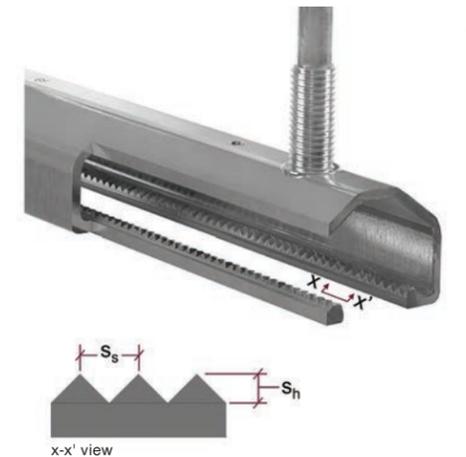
b — HAC-T serrations dimensions.
